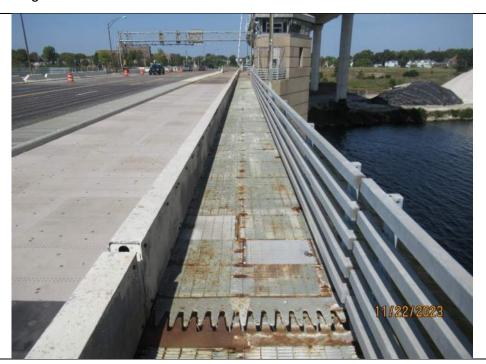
[Span 5] -North leaf east sidewalk and railing, typical good condition of rail and widespread minor corrosion to sidewalk grating, Looking North
